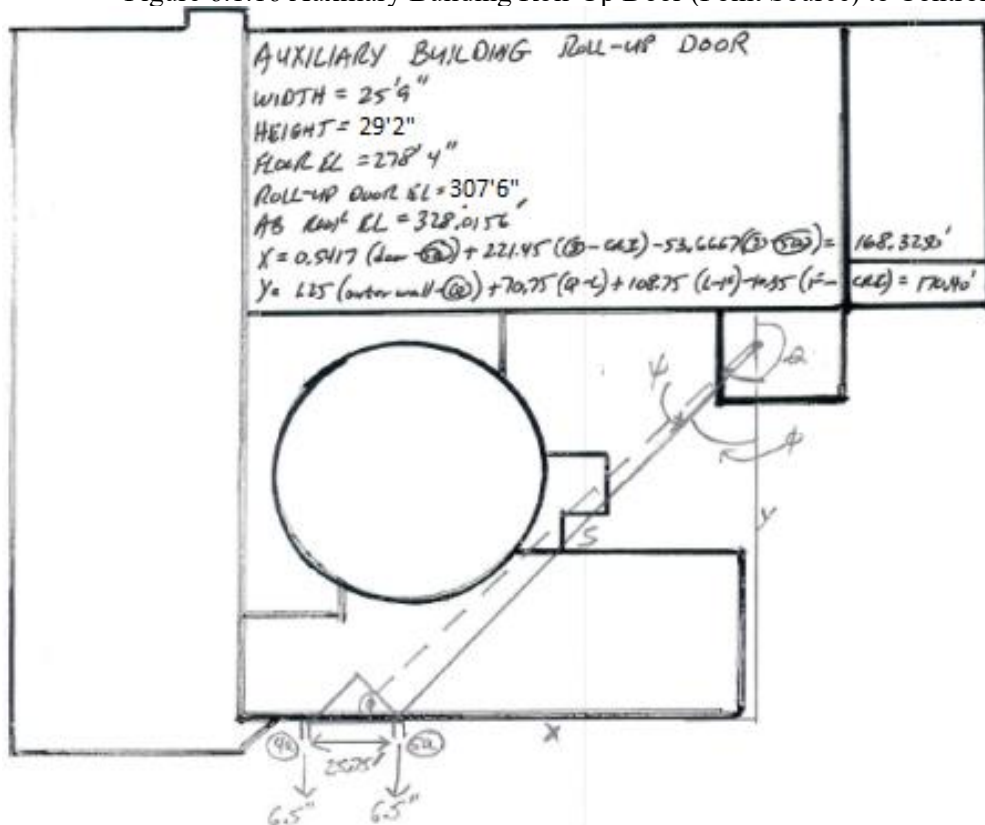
Auxiliary Building Roll-Up Door (Area Source) to Control Room Inlet
